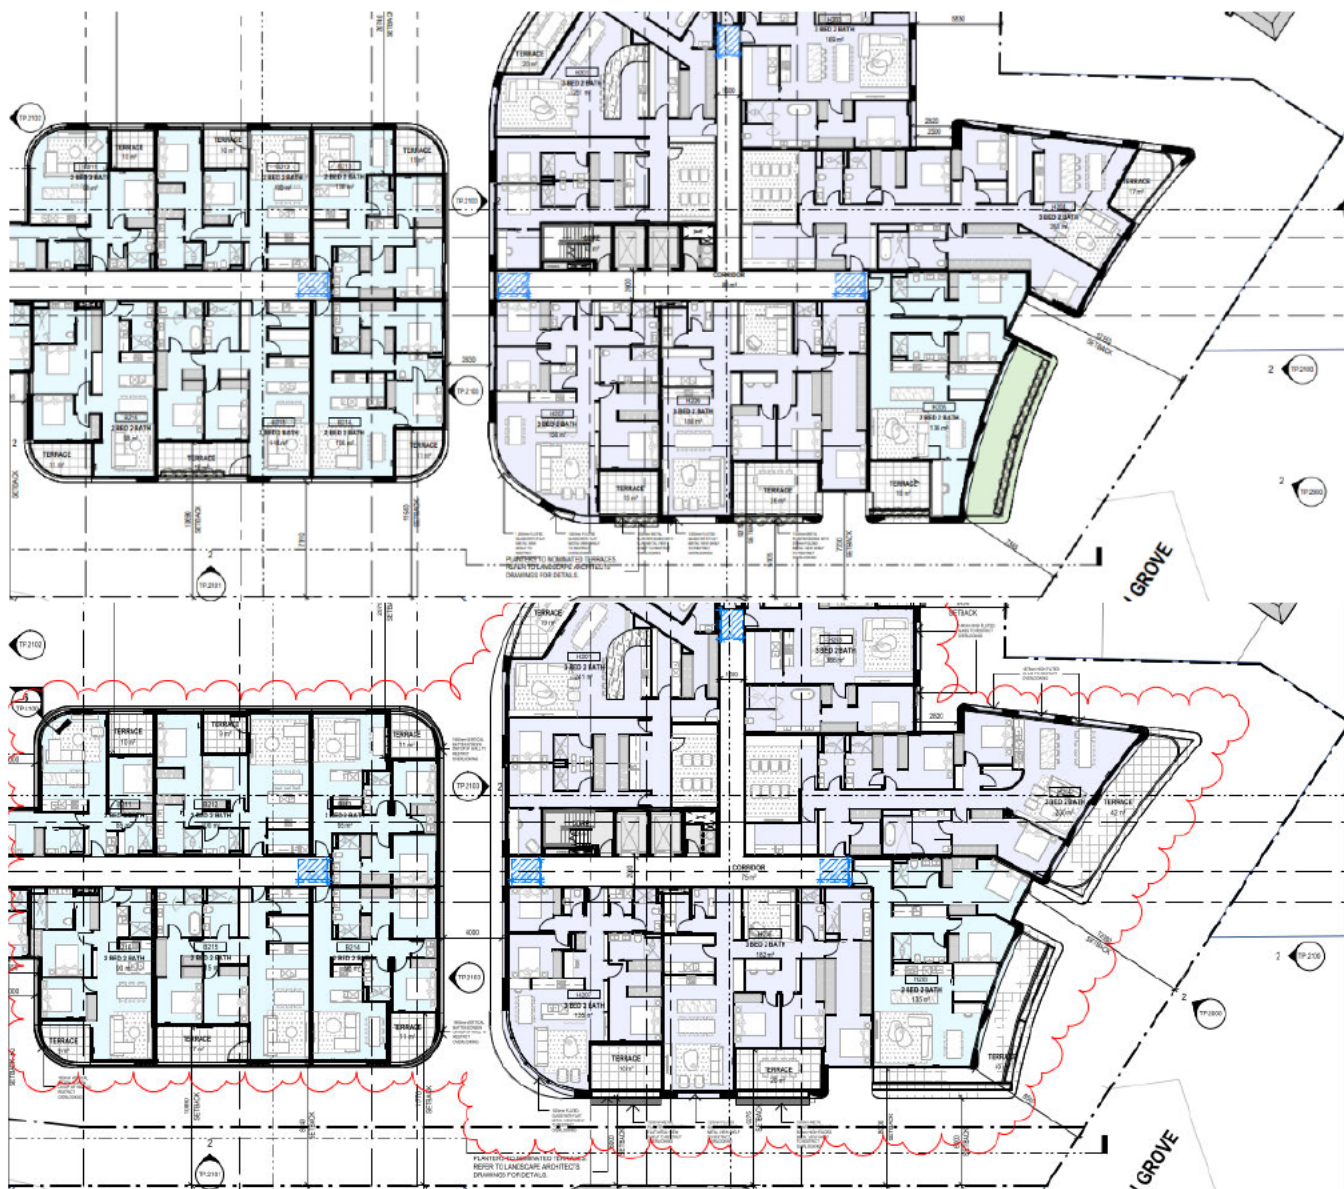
Comparison of Level 2 floor plan between advertised (top) and s57a amendment (bottom) plans
